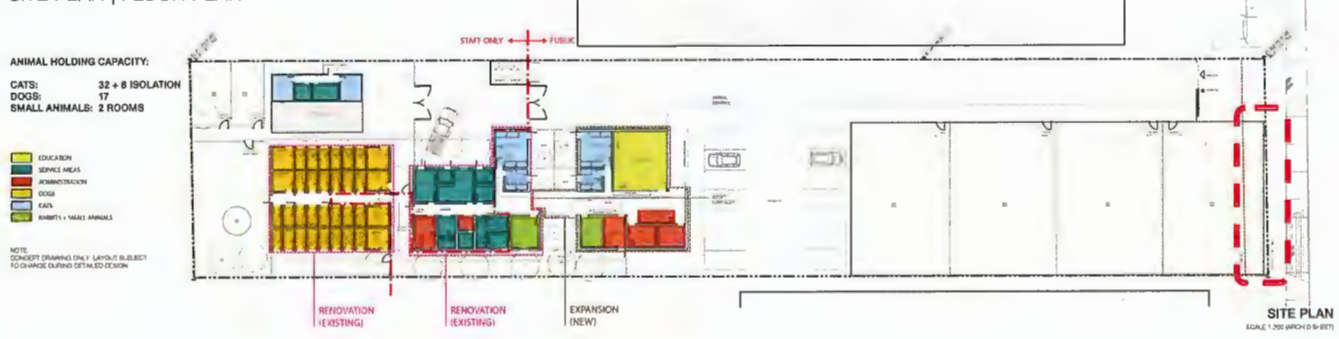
Site Plan of Richmond Animal Shelter Renovation and Expansion. Proposed location of the public artwork is indicated by the red dashed rectangle at the eastern edge of the dog run perimeter fence, parallel to No.5 Road.
